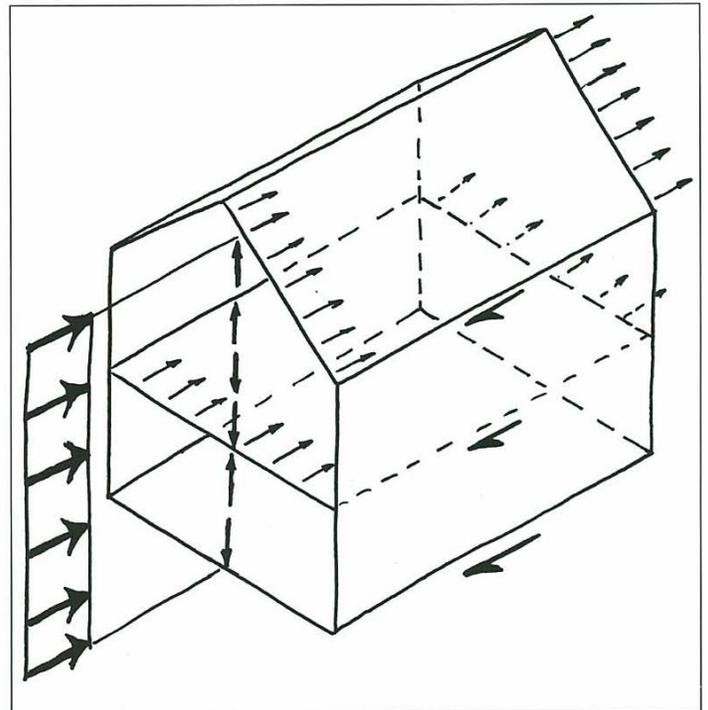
Diaphragms and shearwalls at work. As windward and leeward walls try to push and pull roof and floor with the wind, side walls hold back roof and floor to stabilize building.
